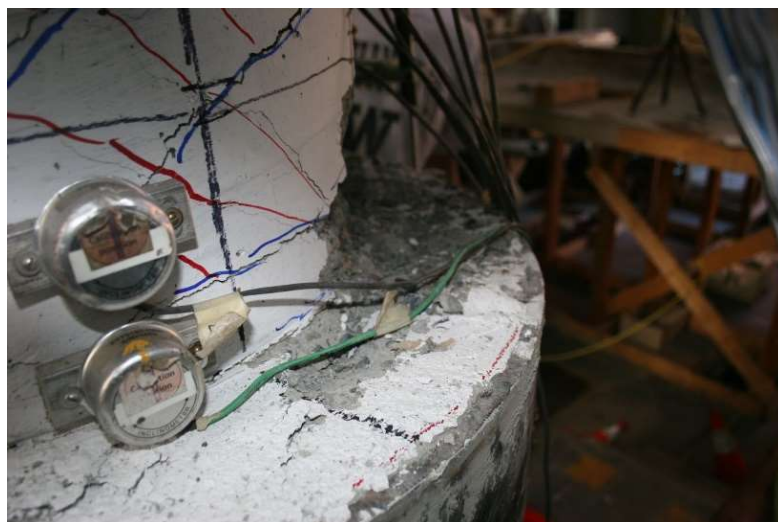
Specimen 30-21-LD Top of Pile Concrete Damage at 5.5% Drift
